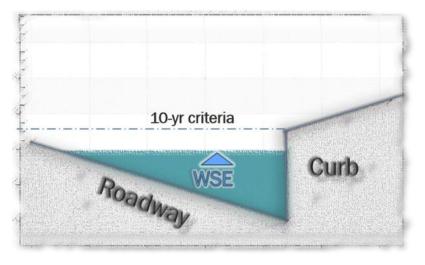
Conceptual cross-section of street flow conduit illustrating 10-yr, 24-hour storm criteria
